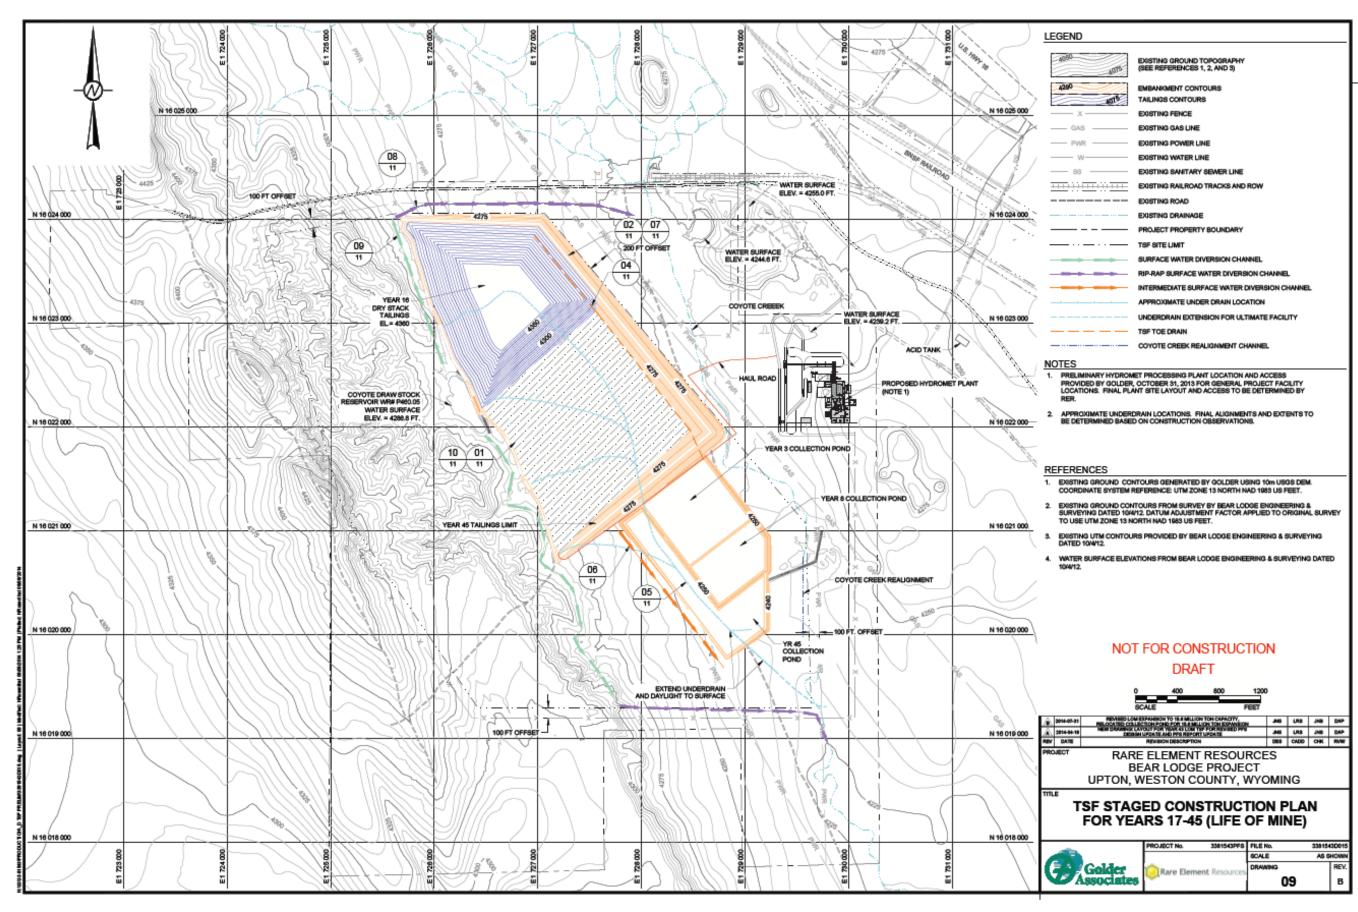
Drawing 09 TSF Staged Construction Plan for Years 17 – 45 (Life of Mine)
